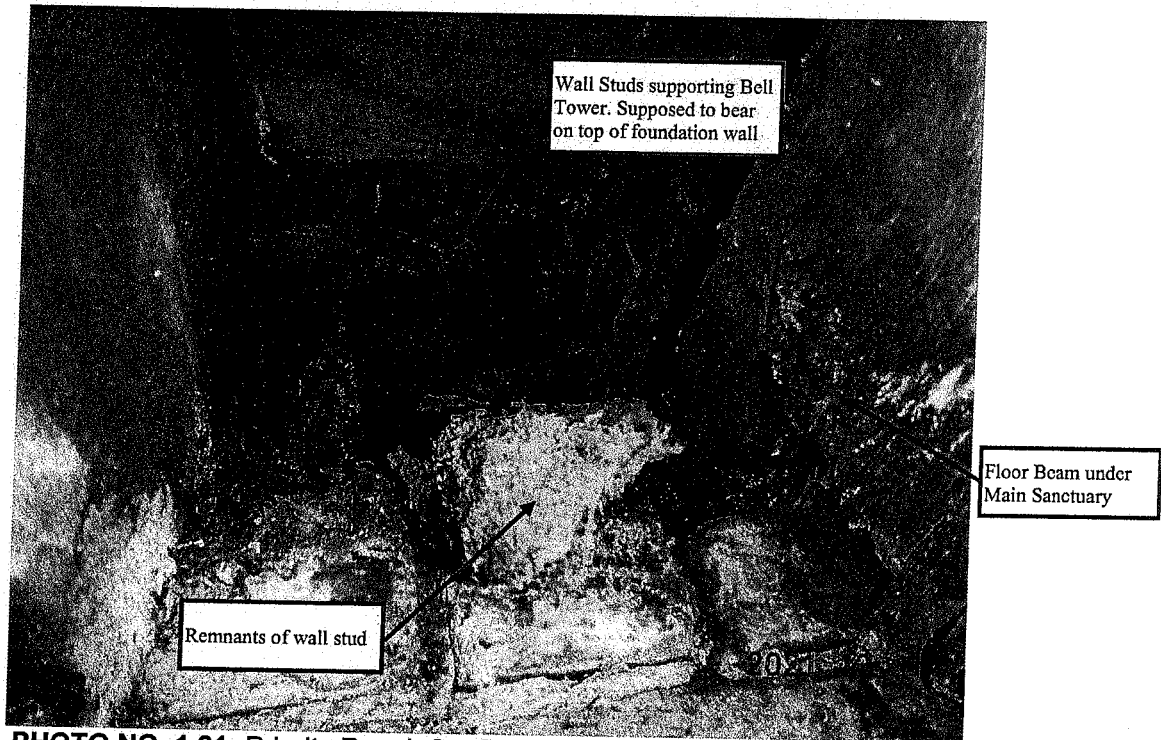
Priority Repair 6 – Severe deterioration, up to 100% sections loss, at the base of timber wall studs supporting the Bell Tower and floor framing for lower level – Lower Level, Grid A/6-7
